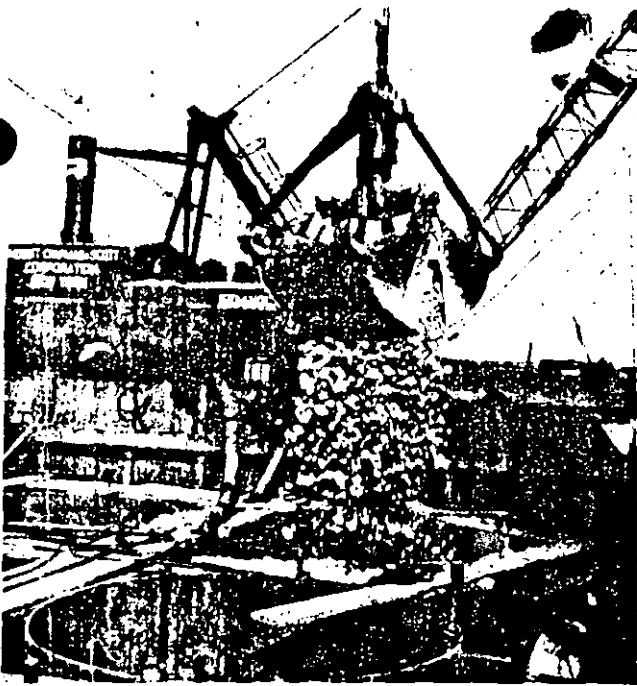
Coarse aggregate being deposited by clamshell from barge for Mackinac Bridge pier located in shallow water. Grout pipes with upper ends protected are supported by short sleeves welded to the caisson shells
